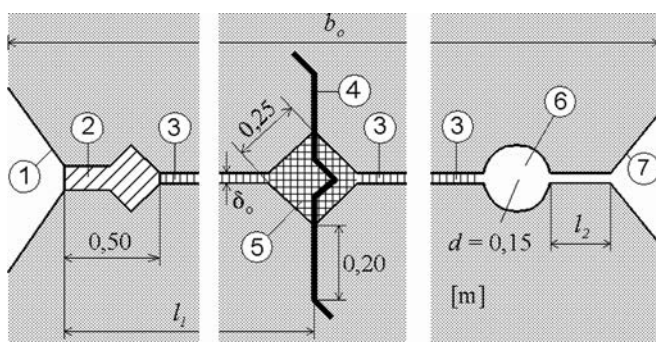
Example of sealing of a vertical deformation joint (horizontal section). (1) Upstream face of the dam; (2) concrete plug; (3) joint, closed, i.e. sealed, with bitumen; (4) waterstop of stainless steel; (5) asphalt mastic (or bitumen); (6) drainage; (7) downstream face.
